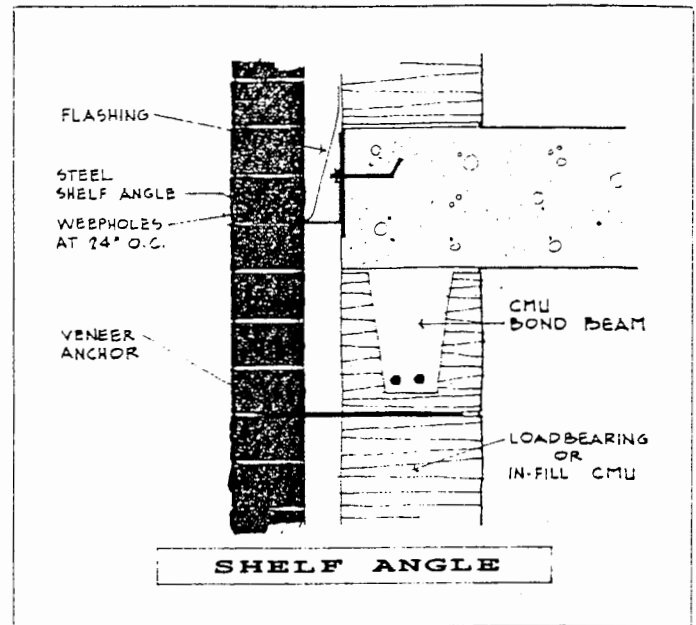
Install flashing above each shelf angle in the wall. Project the flashing beyond the wall face and form a drip. Below the shelf angle install a horizontal soft joint. If the extra-wide joint created by the soft joint is aesthetically displeasing, use a brick shape with a lip.
